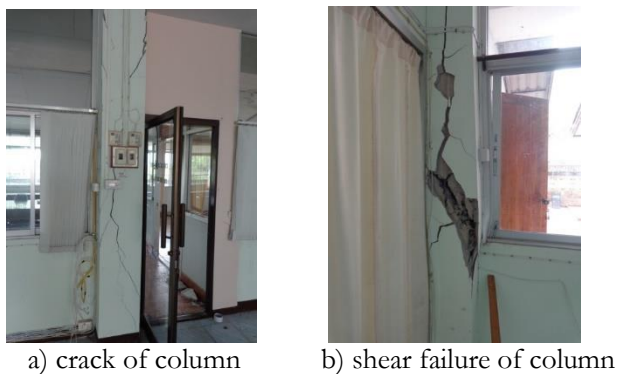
Damage of columns due to short column effect for infilled frame with openings .
